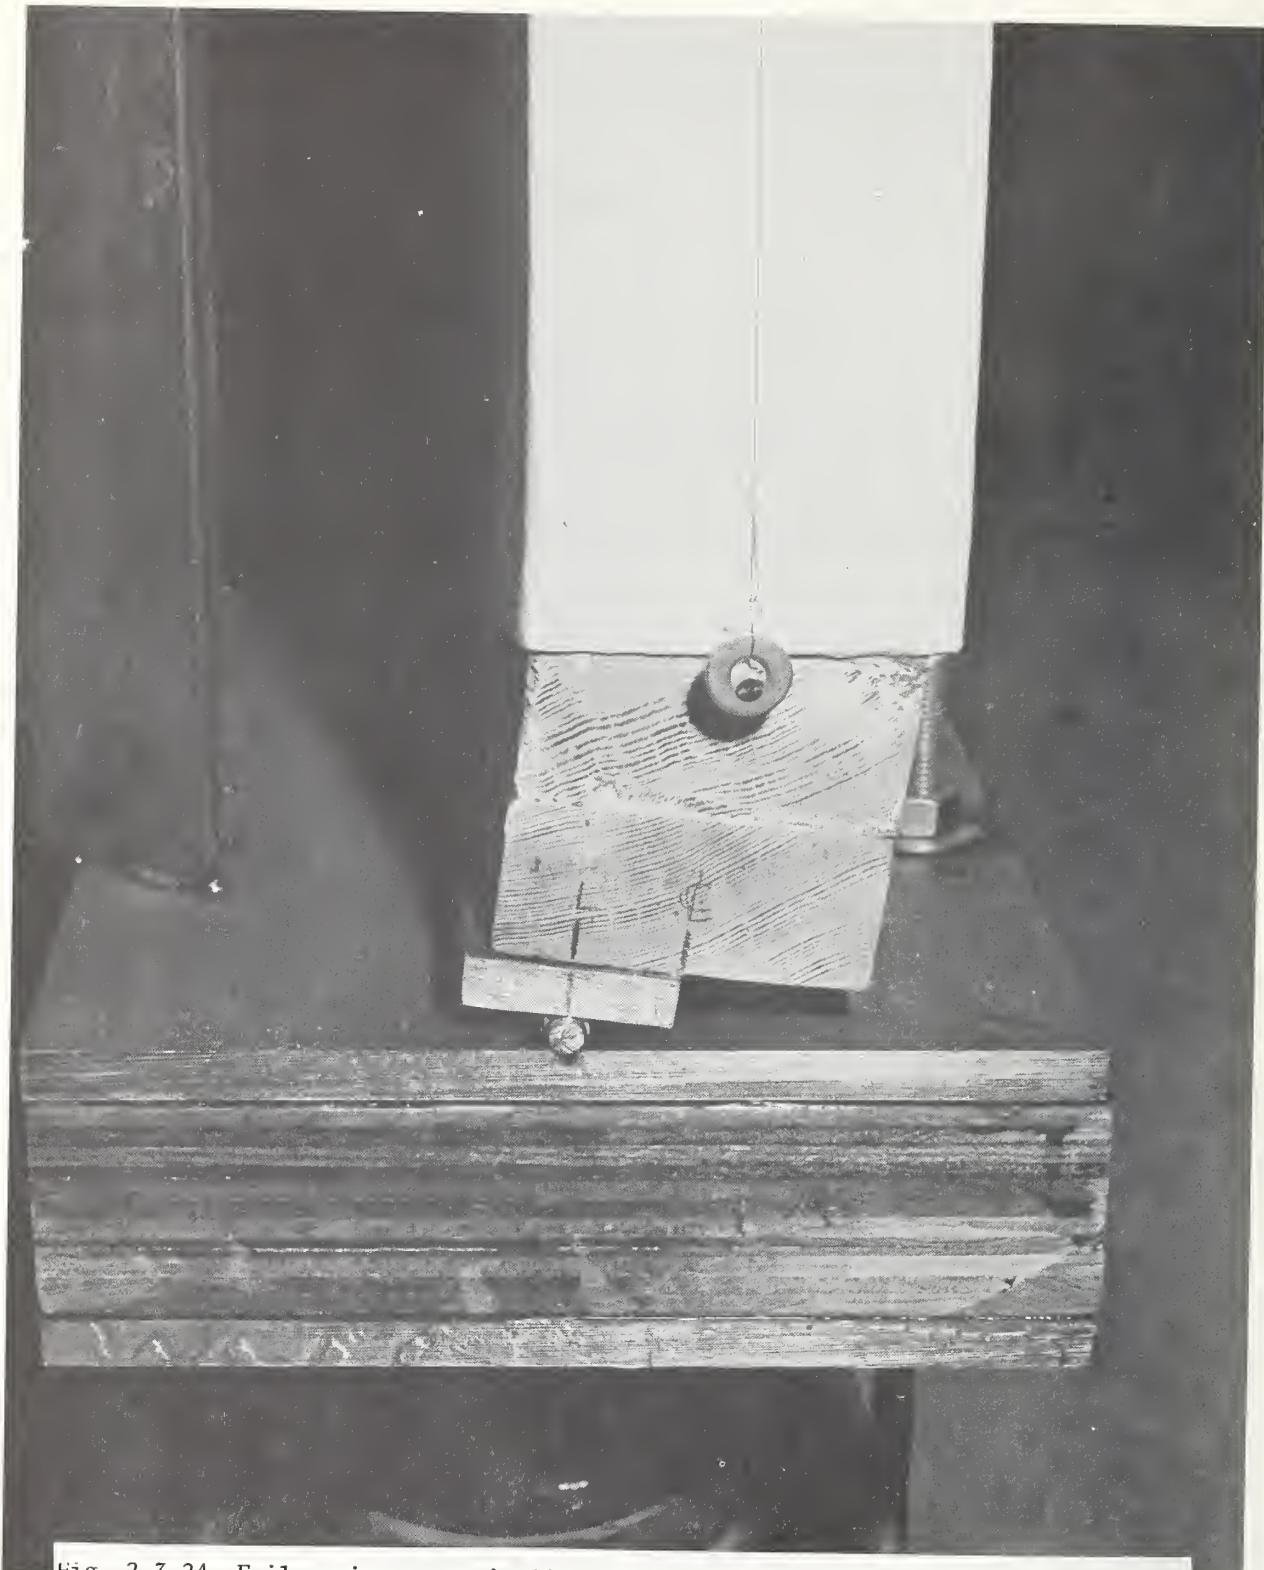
Failure in eccentrically loaded specimen under long-term compressive load test.
